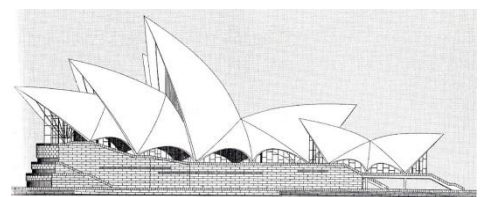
West Elevation with parabolic steel rods and glass walls. Note the elegant shapes and excellent proportions.
